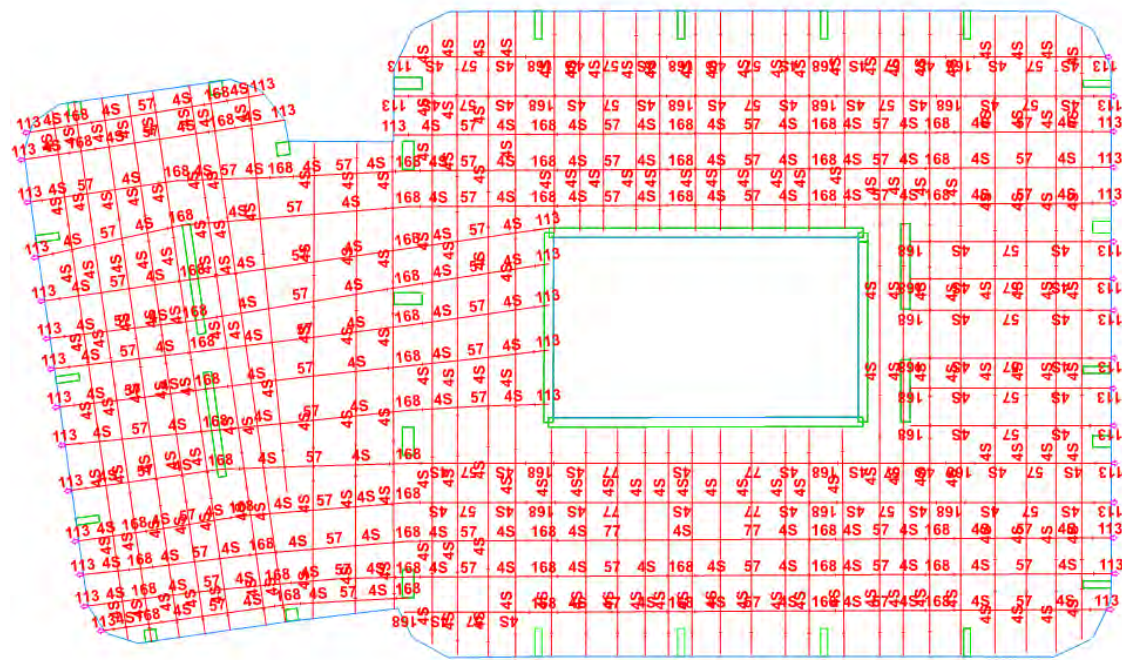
Block K floor plate plan of post tension tendons and strands (PT)
